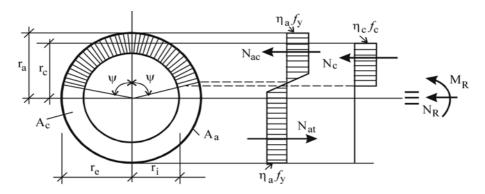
Modeling of stresses in the steel tube and concrete cross-sections under bending with a concentric force
